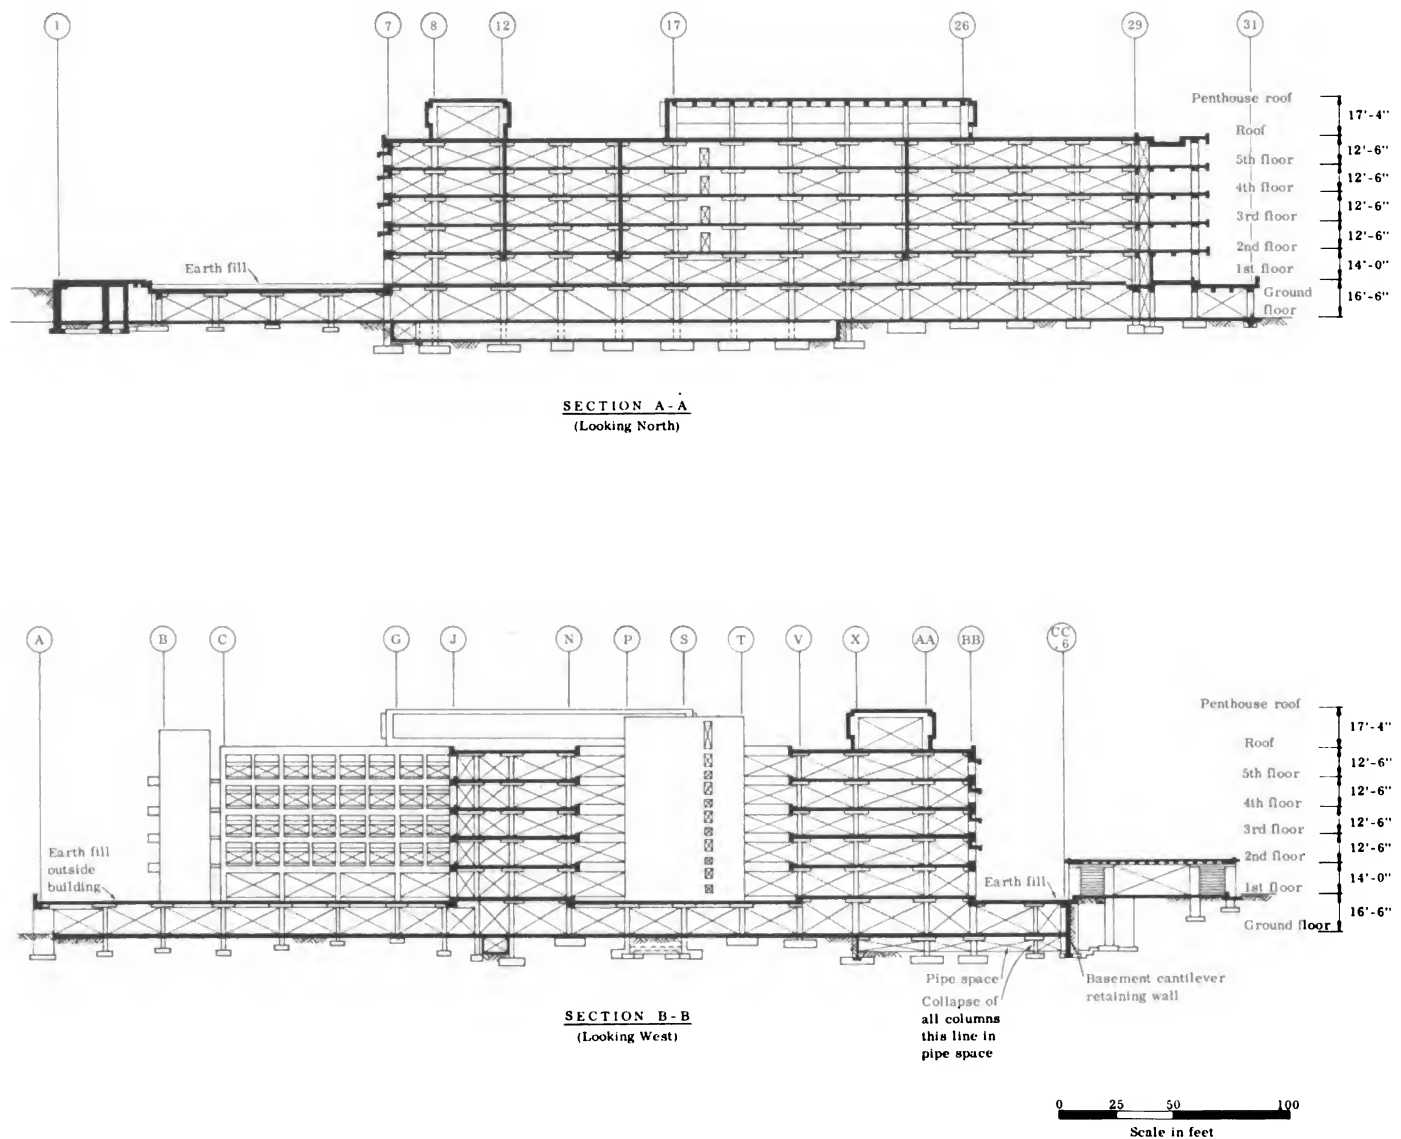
Olive View Hospital, medical treatment and care unit. Building cross sections.
